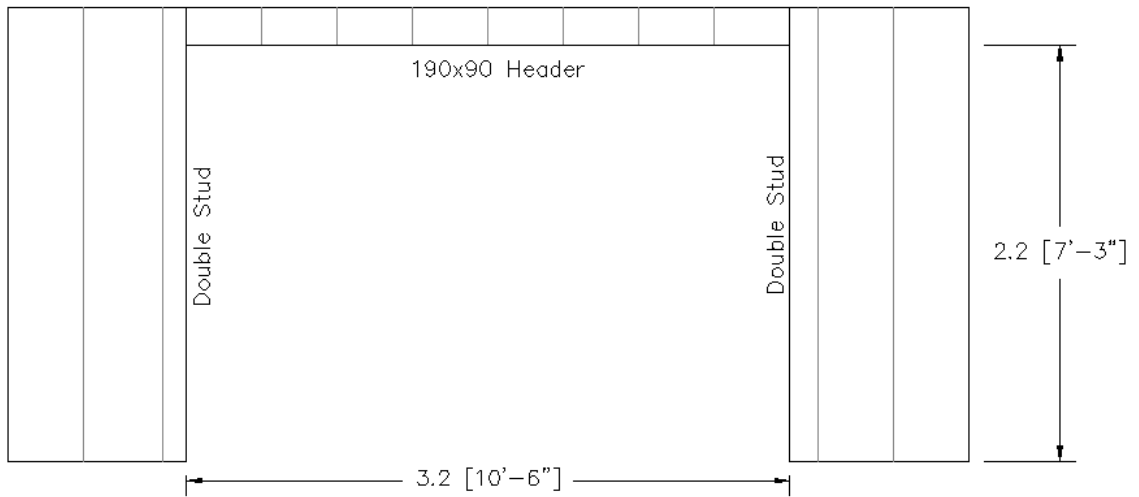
Framing Detail for Openings used in Uplift Investigation
